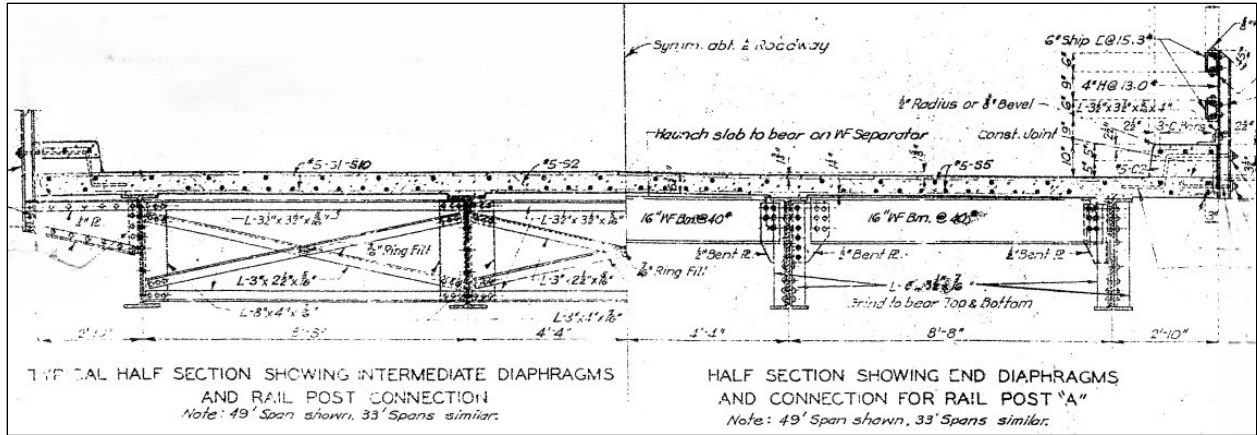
Cross-section of end and intermediate diaphragms of the L472 Bridge
